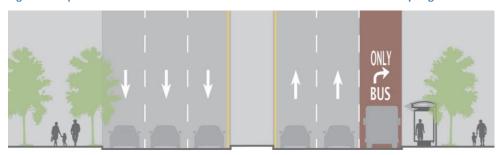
| Alternative 6 Cross-section of Spring Hill Road from International Drive to Boone Boulevard
